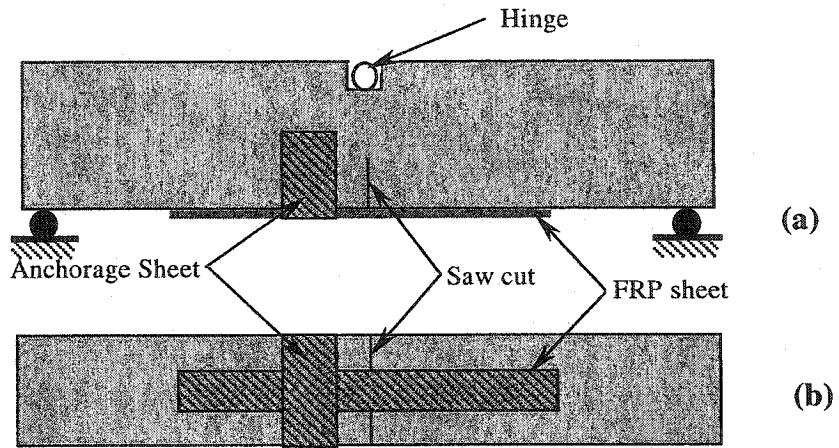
Bending bond test (a) elevation (b) bottom plan view
